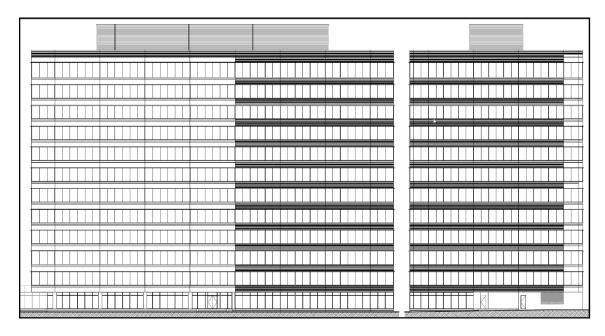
The "West Office Building". North (left) and West (right) façades. Curtain wall layout similar on South and East façades. Adapted from Adapted from Dietzmann, J. M., Jr. (2014).
